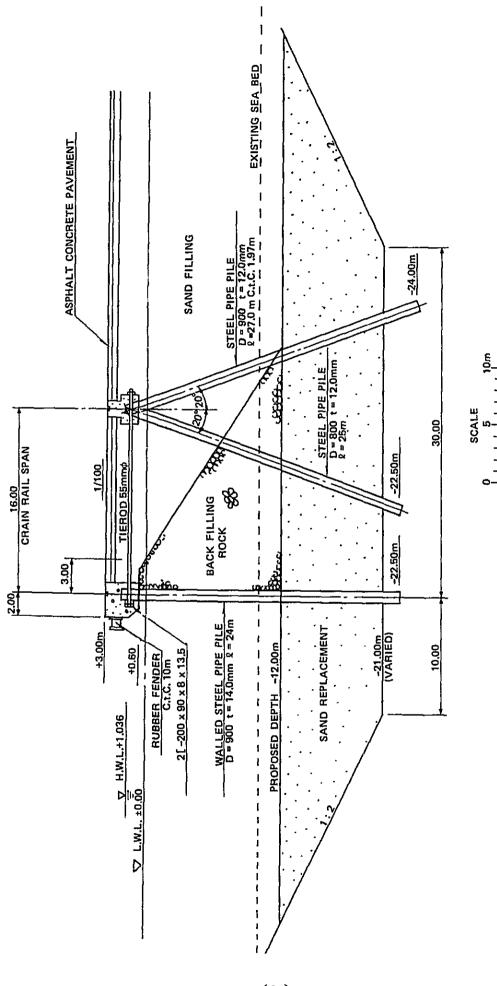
Container Berth Quay Wall (Walled Steel Pipe Pile Type)
